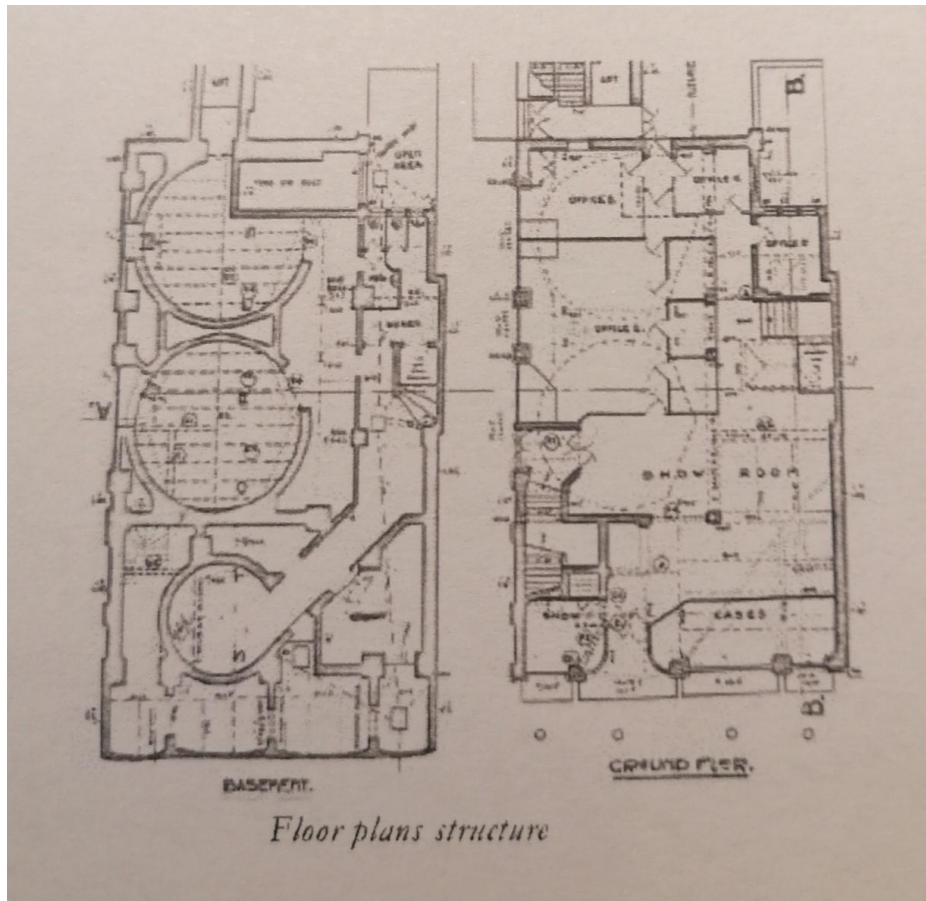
Basement and Ground Floor construction drawings of South Kentish Town (then known as Castle Road) revised drainage plan 1906. [© original London Transport Museum 1998/90350 reproduced in Pre-Application Planning, Design and Access Statement (Feb 2018) Cooley Architects] At South Kentish Town there remain tiled station names where the platforms once were, and as late as the 1960s much of the internal tiling survived (Figures 2 & 10).
